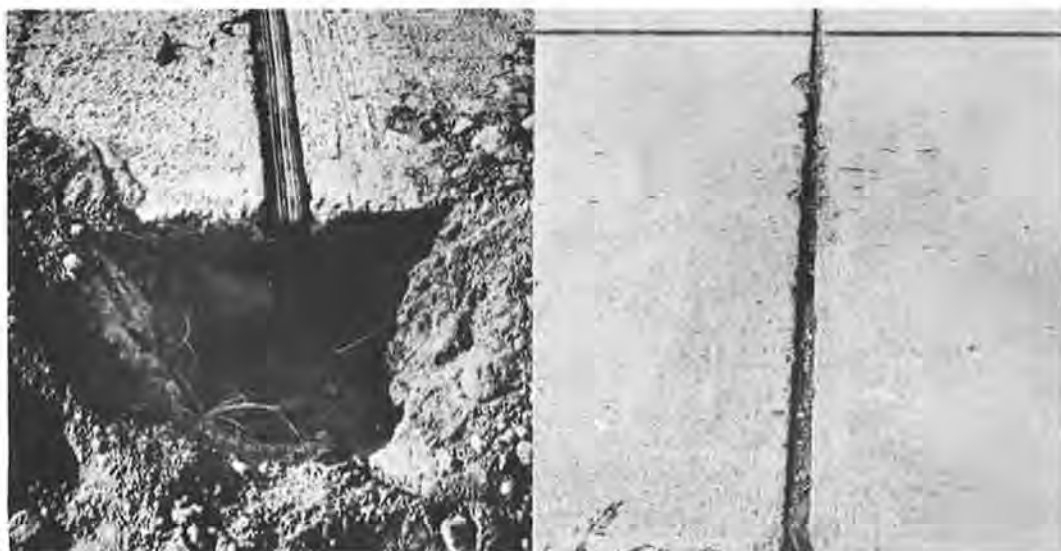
Air chamber expansion joint, Type TB-(4) Series 9A, Station 171+10. (Left) at time of construction, 1940. (Right) same joint 2 years later (1942) when joint had to be repaired.
